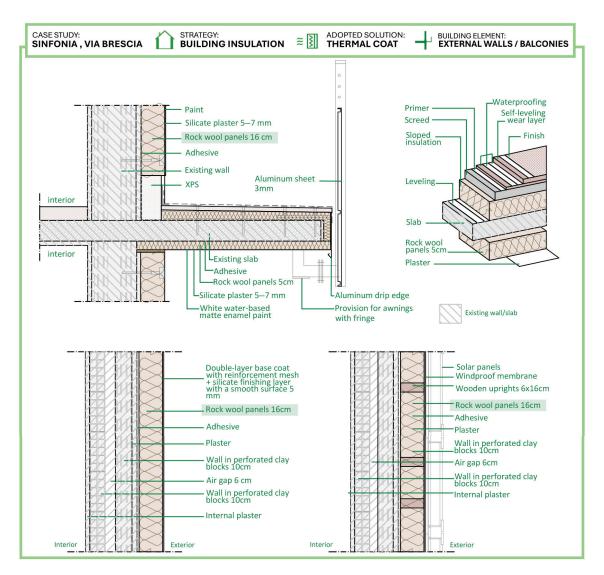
Exemplification of the portfolio of technical solutions for thermal insulation of Building 2 on Via Brescia—Via Cagliari in Bolzano. Image edited by the authors from original drawings by © Studio Tecnico Vettori.
